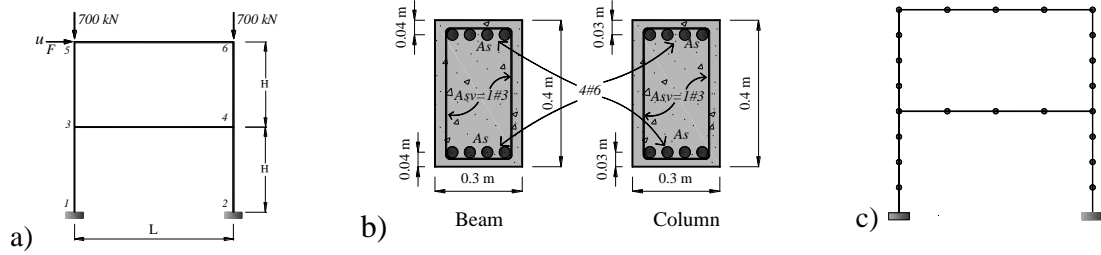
Two story reinforced concrete frame: a) geometry, b) discretization and c) cross sections
